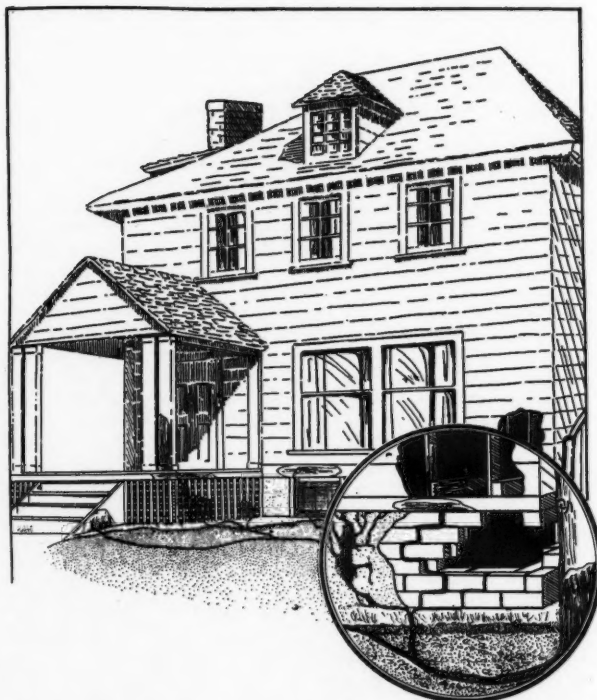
View of a frame house to show how subterranean termites gain entrance to the building through: (1) Untreated wood in contact with the ground; (2) in earth-like shelter tubes constructed over stucco or concrete; (3) through improper grades of mortar in foundation walls
